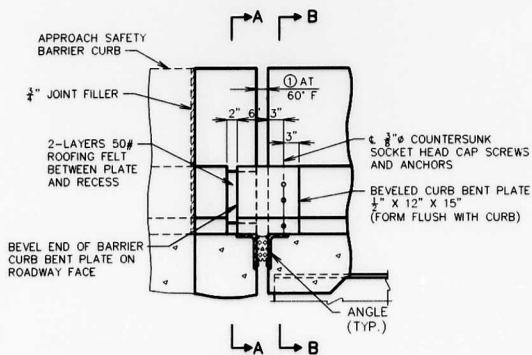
DETAILS OF PREFORMED COMPRESSION JOINT SEAL
